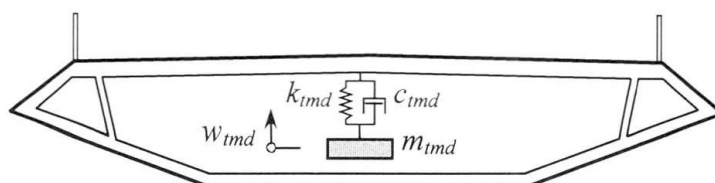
Cross section of bridge girder with a tuned mass damper, TMD
